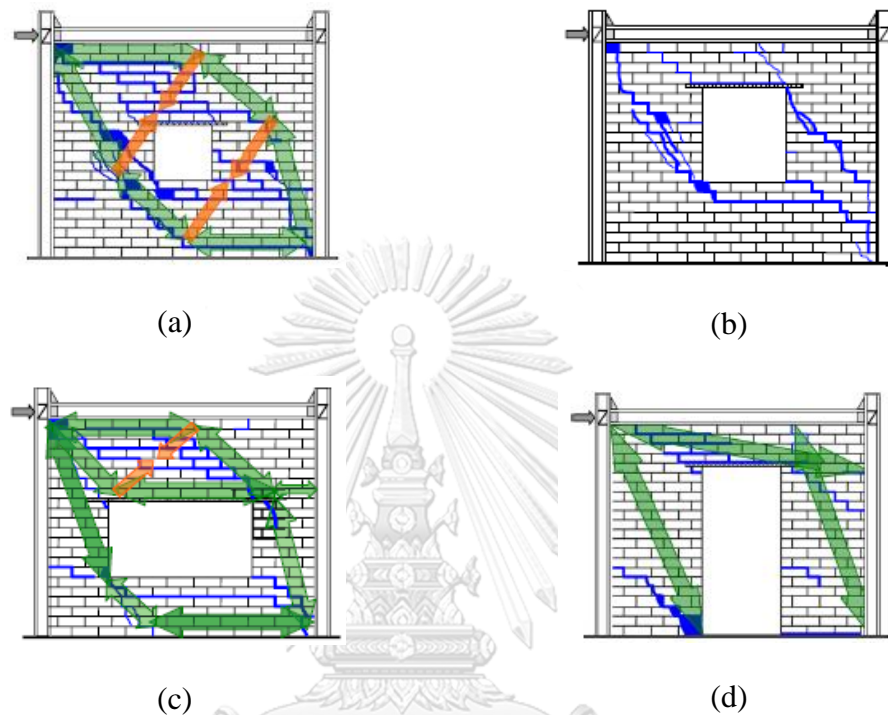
Failure modes of the specimen and the activated stress field, (a) Specimen PW1, (b) Specimen PW2, (c) Specimen PW3 and (d) Specimen PW4
